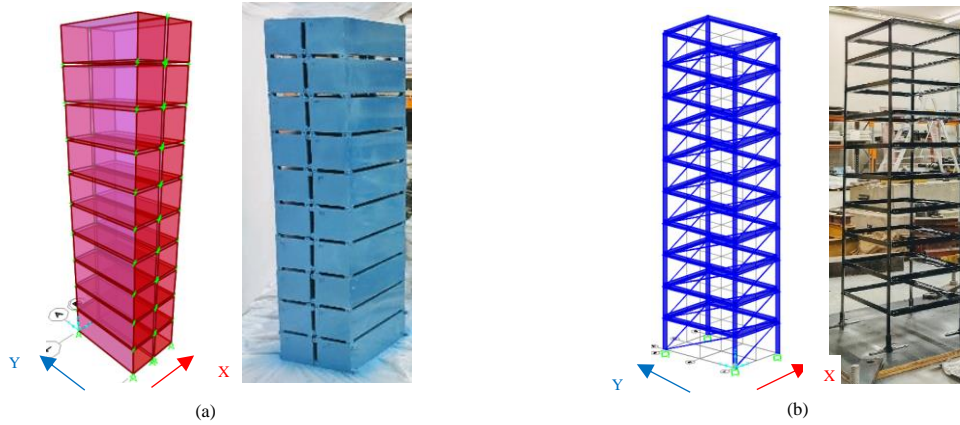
FEM & Experimental Models of (a) Modular building (b) Conventional steel building
